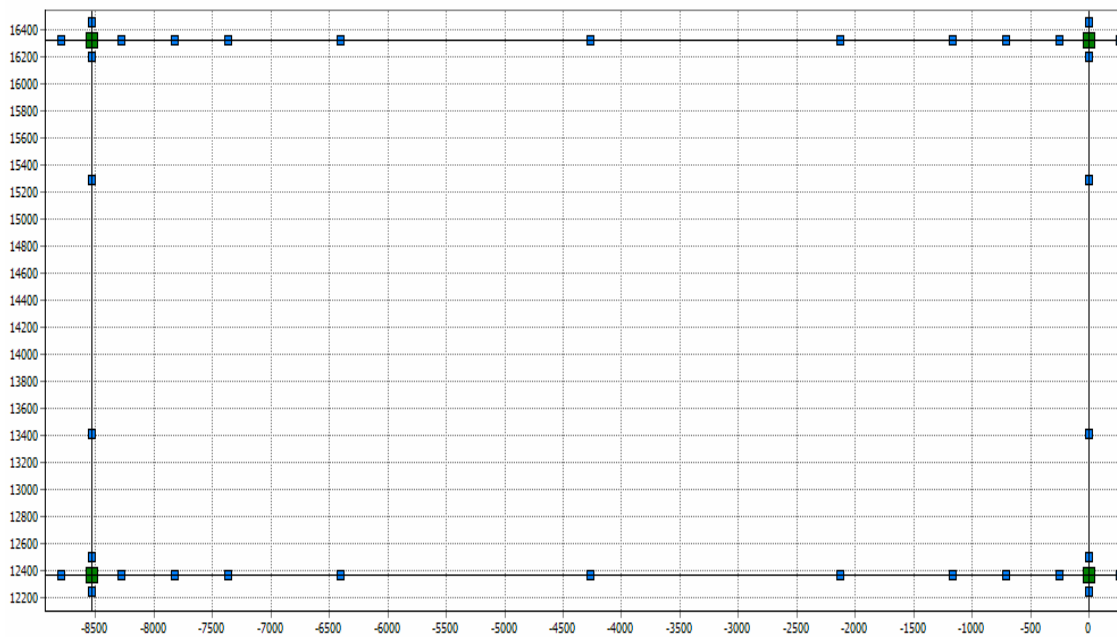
Details of typical modeling of frame members (units in mm)
